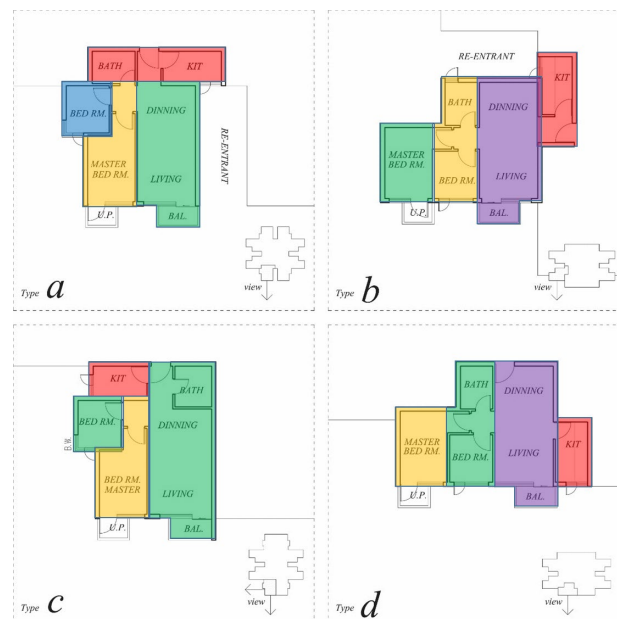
Modularisation of typical two to three-bedroom unit floor plans
